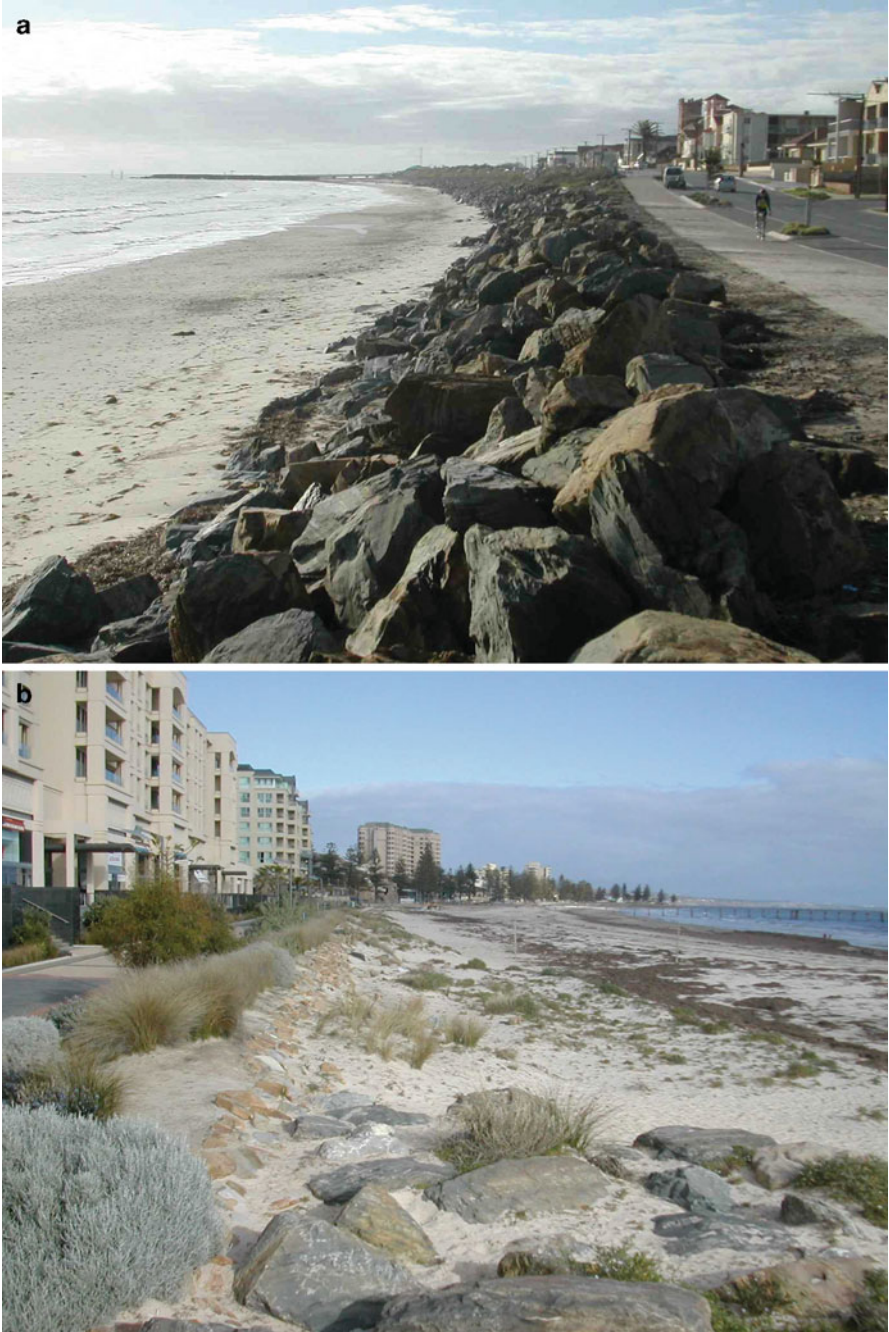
(a) Seawall at West Beach looking north to Henley Jetty; and (b) partly sand covered seawall at Glenelg Beach (Photos: A. D. Short)
